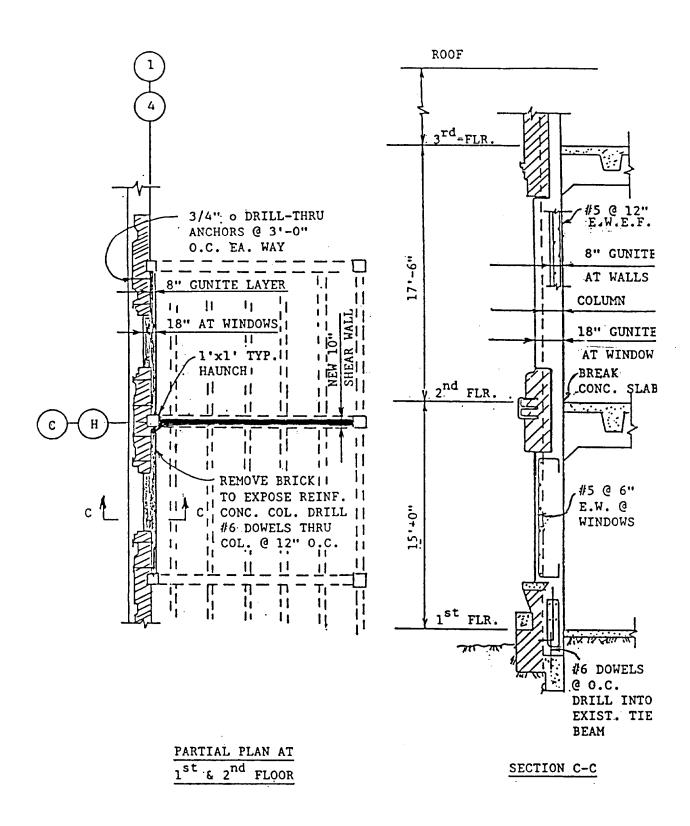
Brick building with concrete framing system. (Sheet 13 of 25)
